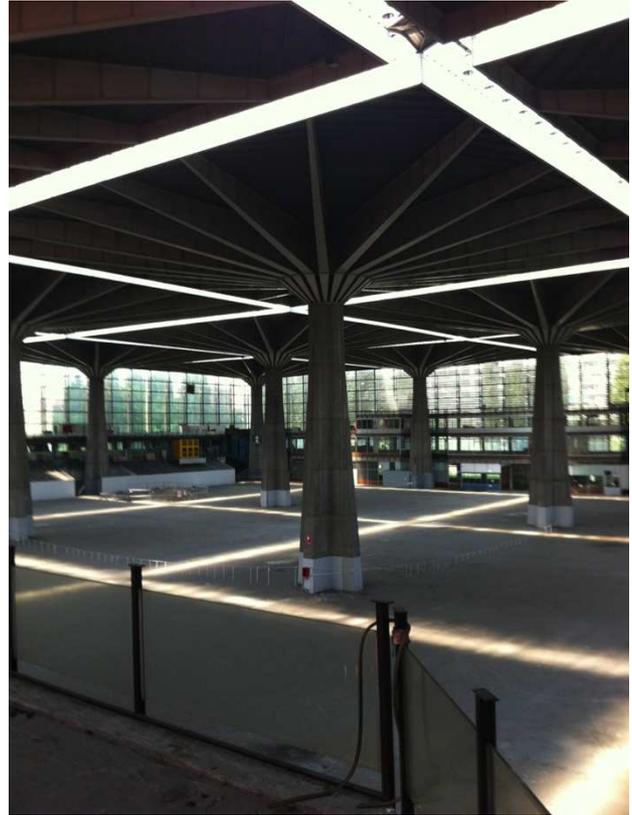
Palazzo del Lavoro, Turin. Pier Luigi Nervi and Antonio Nervi, 1960-61; Interior view showing formally transitional piers and mushroom roof structure (Photo by the author)
